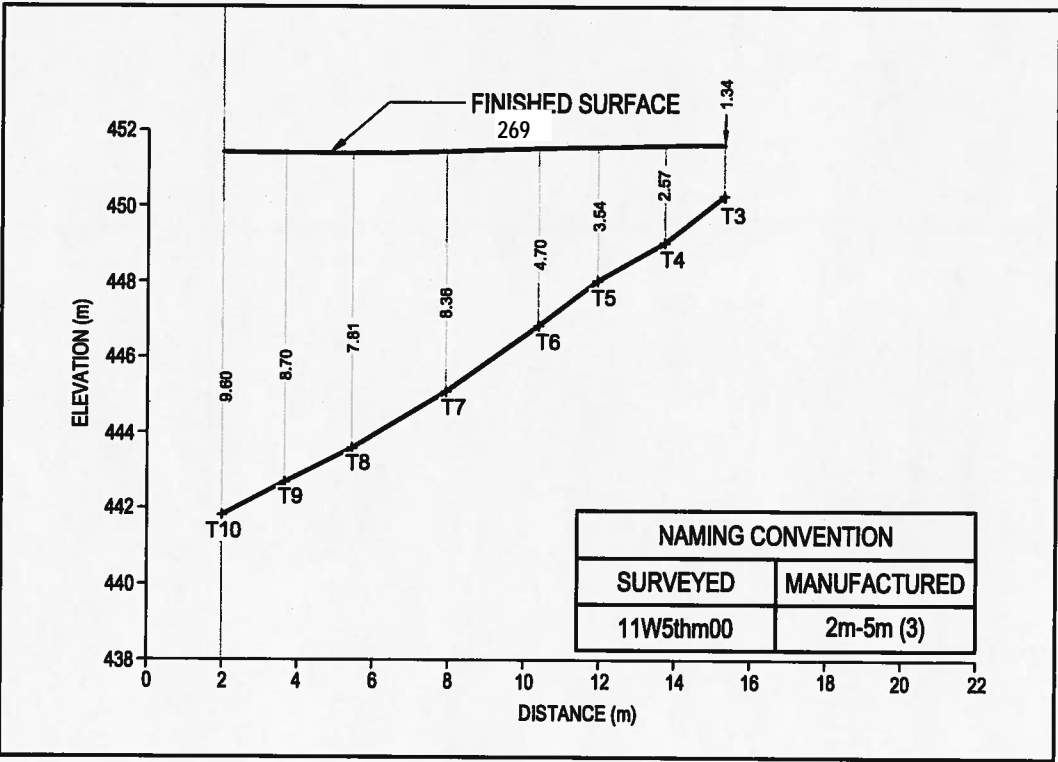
11W5thm00 (2m-5m (3)) - AS MANUFACTURED, PLAN, AND SECTION
